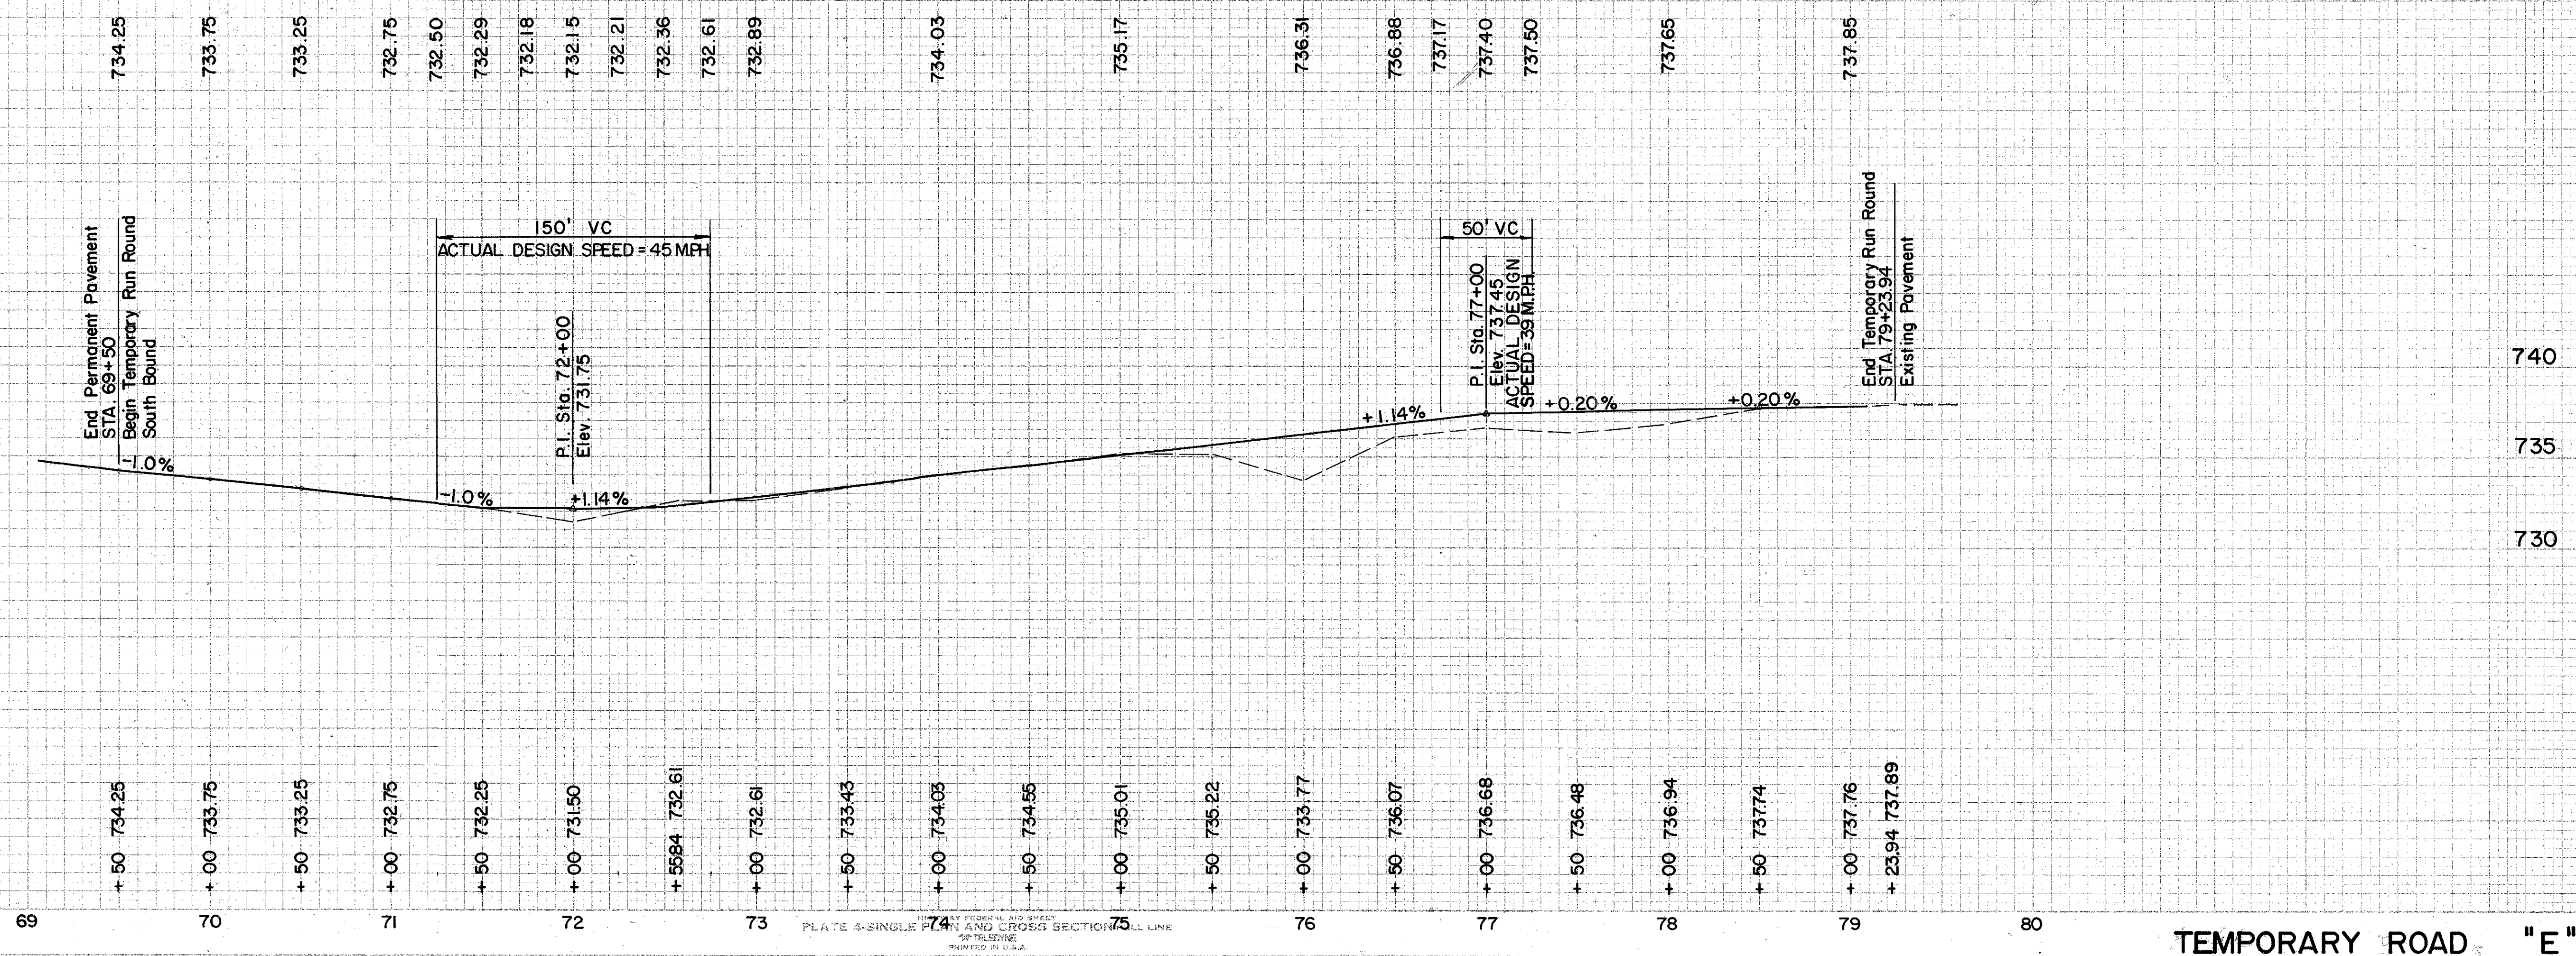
SINGLE PLAN AND CROSS SECTIONAL LINE
